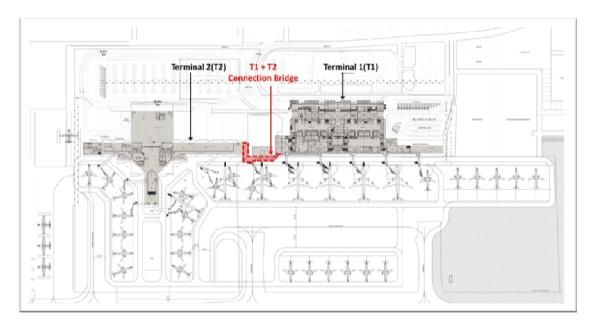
Layout of terminal T1 and terminal T2 connected by a bridge
